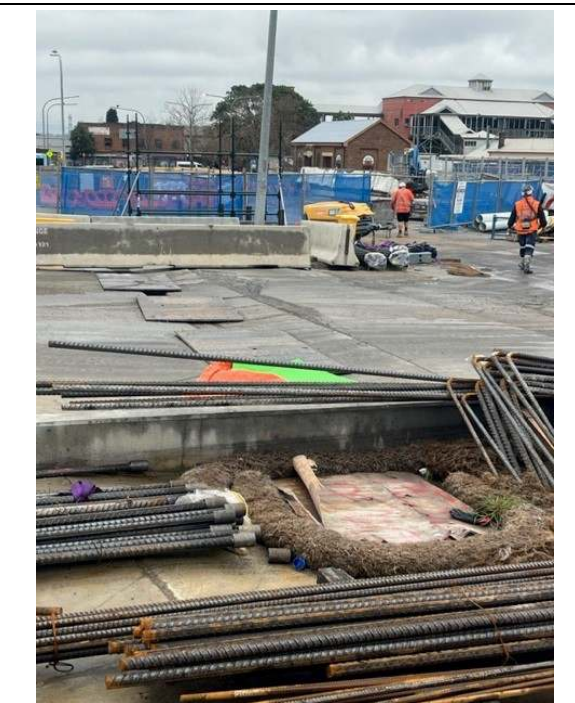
Noise blankets installed at top of batter on hoarding to reduce noise impact to surrounding residents.
